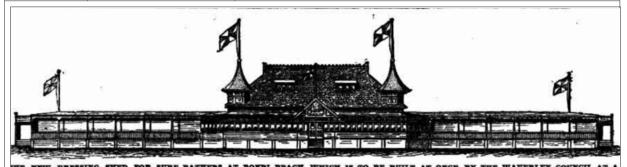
Proposed New Surf Pavilion, Source: Evening News 15 & 17 June 1910
